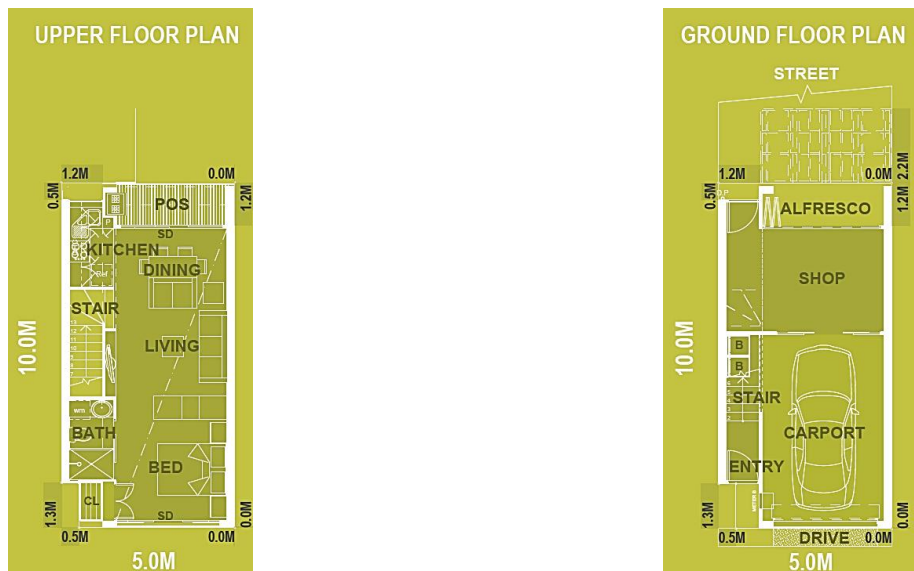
Floor plans of the smallest ecHo approved for construction at Fitzgibbon Chase, Brisbane
